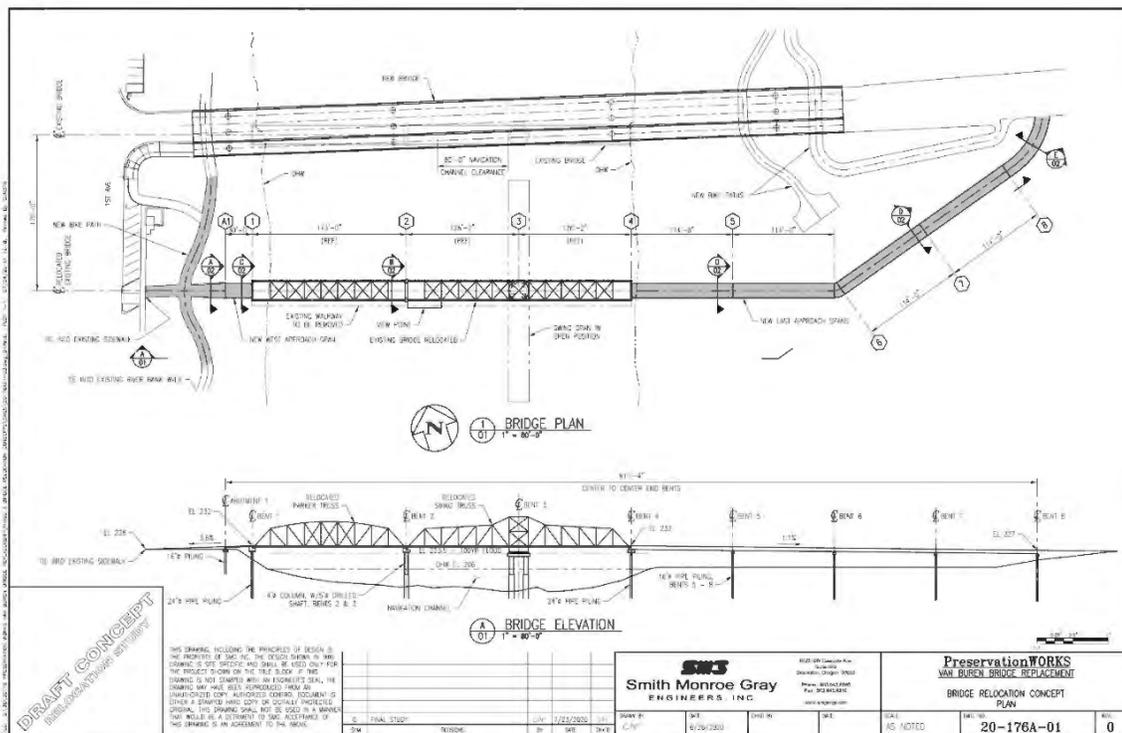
Smith Monroe Gray Engineers, Inc. Bridge Relocation Concept Plan Drawing no. 20-176A-01.
